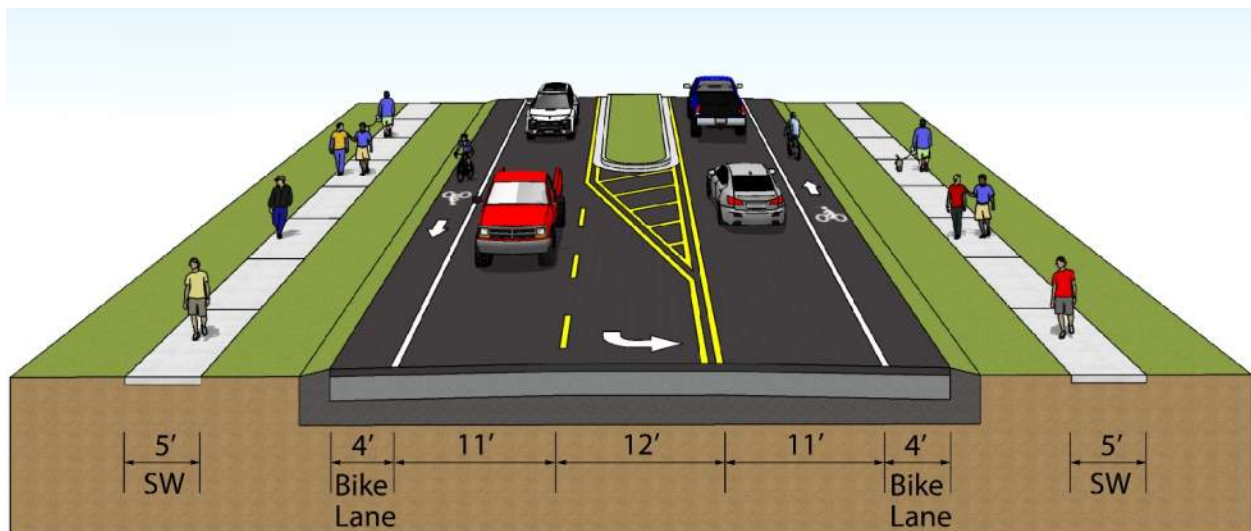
Proposed Typical Section from Michigan Avenue to Ketch Circle
